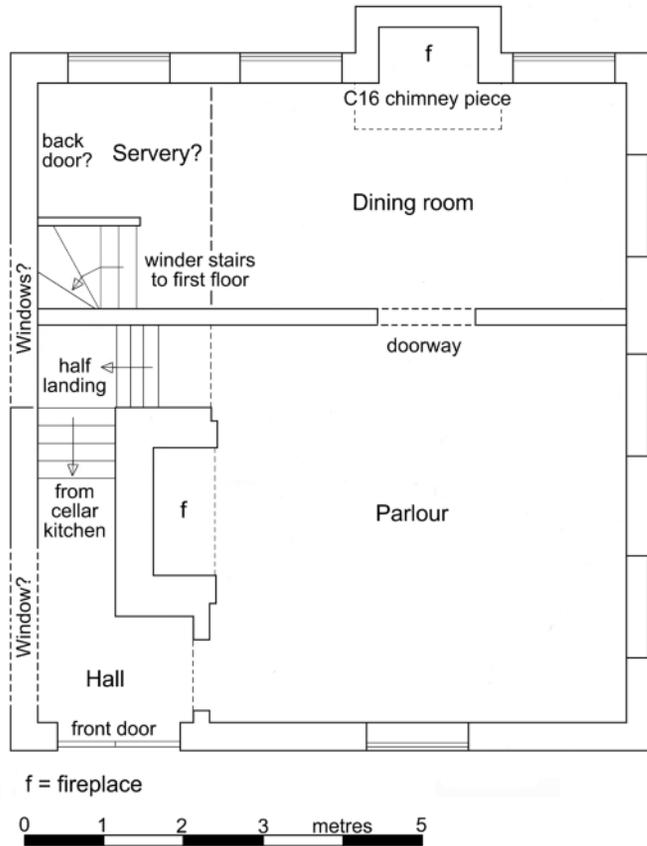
Deduced ground-floor plan showing original access passage and steps to the cellar-kitchen
